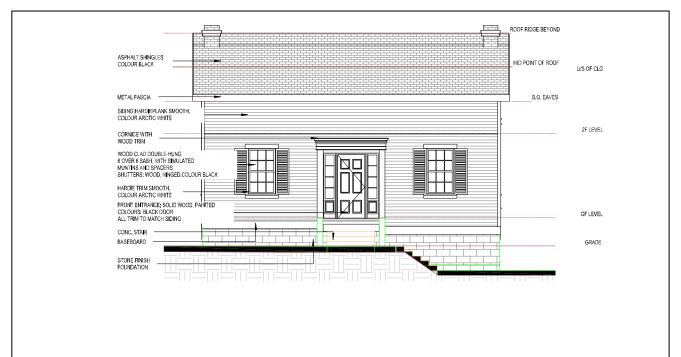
Proposed front (north) elevation for No. 89 Nashville Road.
